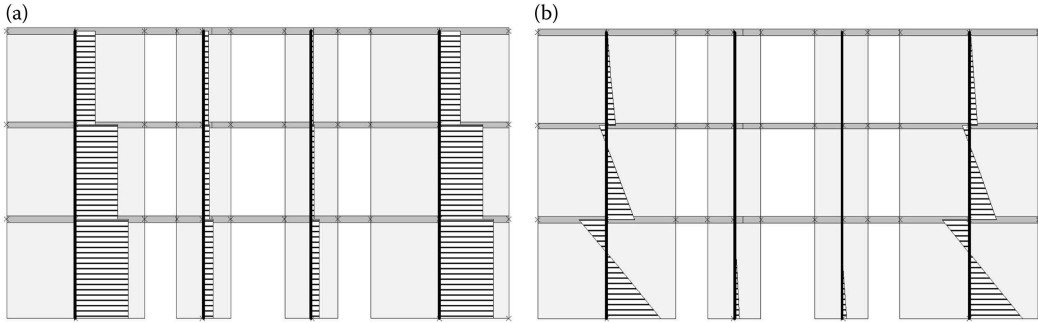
Distributions of shear forces (a) and bending moments (b) along the height of masonry piers in the North façade of the example structure.
